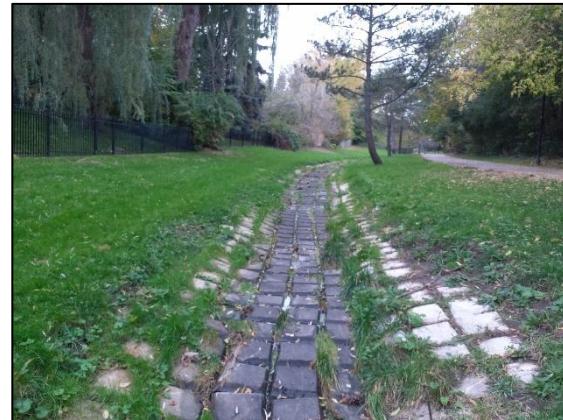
Cablecrete and Armourstone Through Bayview Village Park
